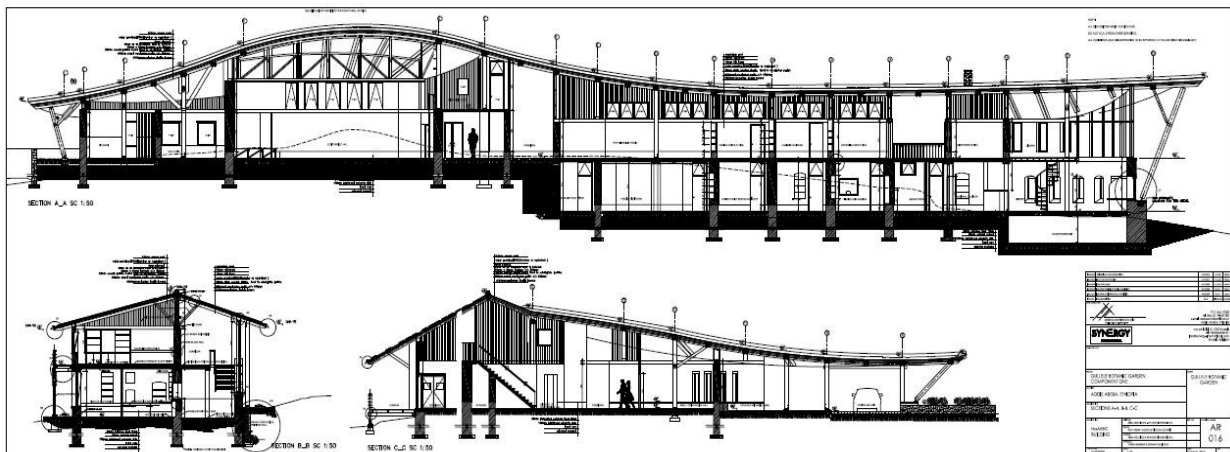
Section drawing showing the Gulele HOAREC building with its green roof, Image source: ABBA Architects plc.
